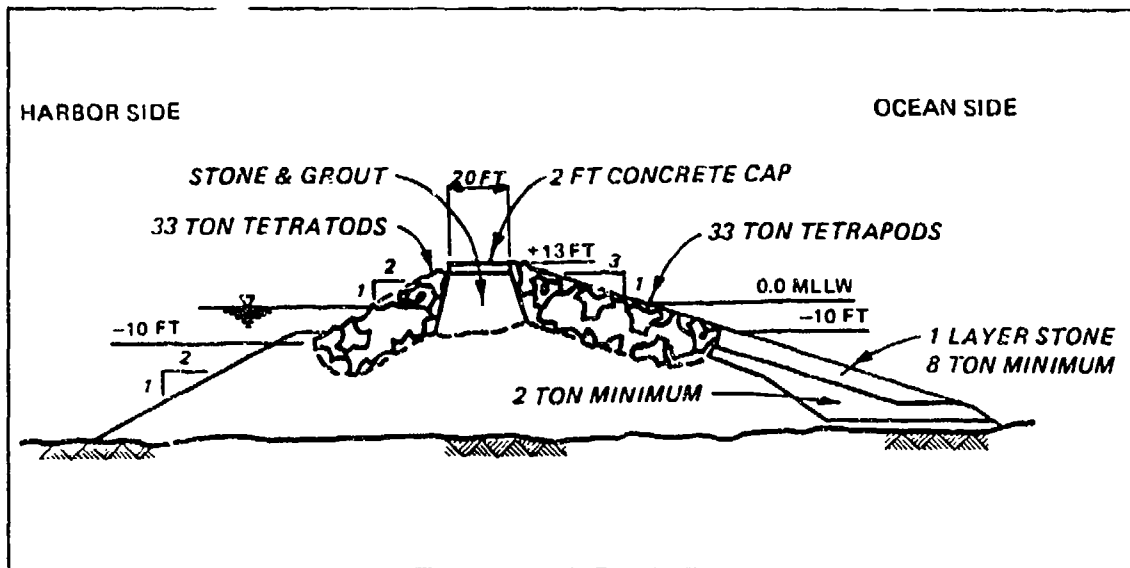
Kahului breakwater repairs of 1956 (typical cross section)
